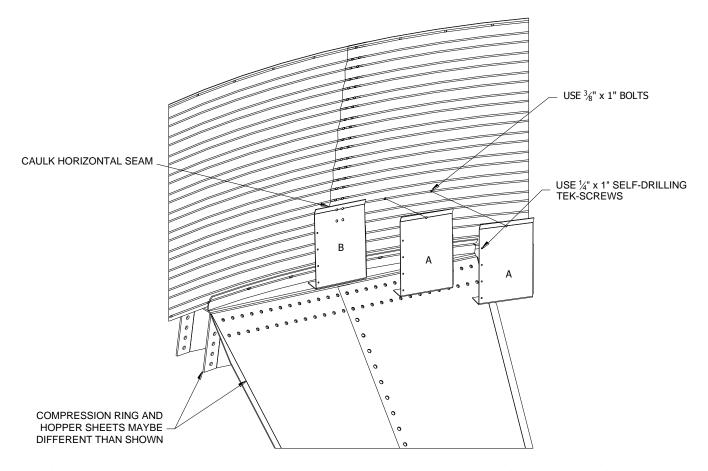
Connection Detail for 36' Upper Hopper Sheets
